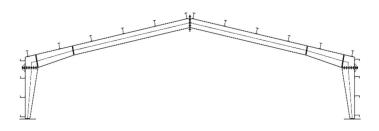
Geometry of the selected welded-tapered frames (University of Navarra, 2010).
